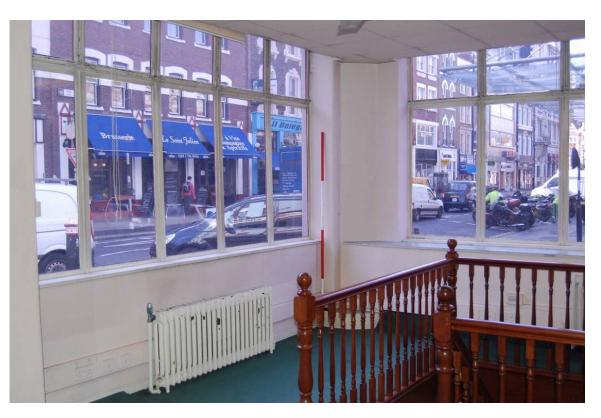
20-23 Long Lane and 22 Lindsey Street, general view
